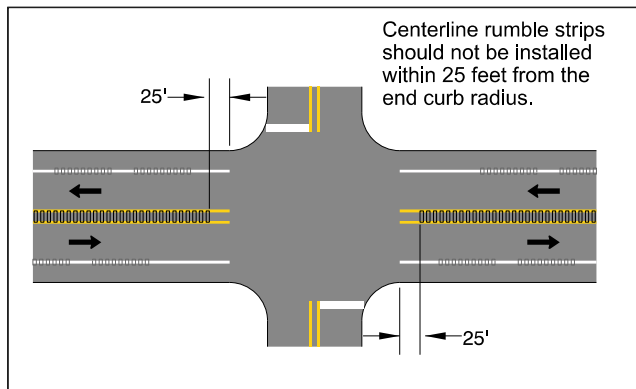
O: Centerline Rectangular Rumble Strip Typical Intersection Installation on Multilane Highway
